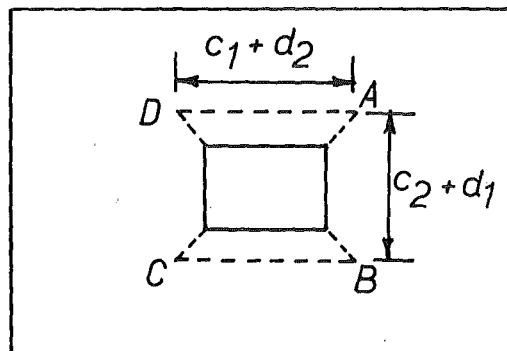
(a) and 3.4(b) show the view and section of a slab adjacent to an interior column. Two possible modes of failure were considered. The first, termed as "moment-torsion", involves failure on all four column faces. The ultimate torsional strength is reached on side faces BC and AD and the ultimate flexural strength on faces AB and CD. The second
